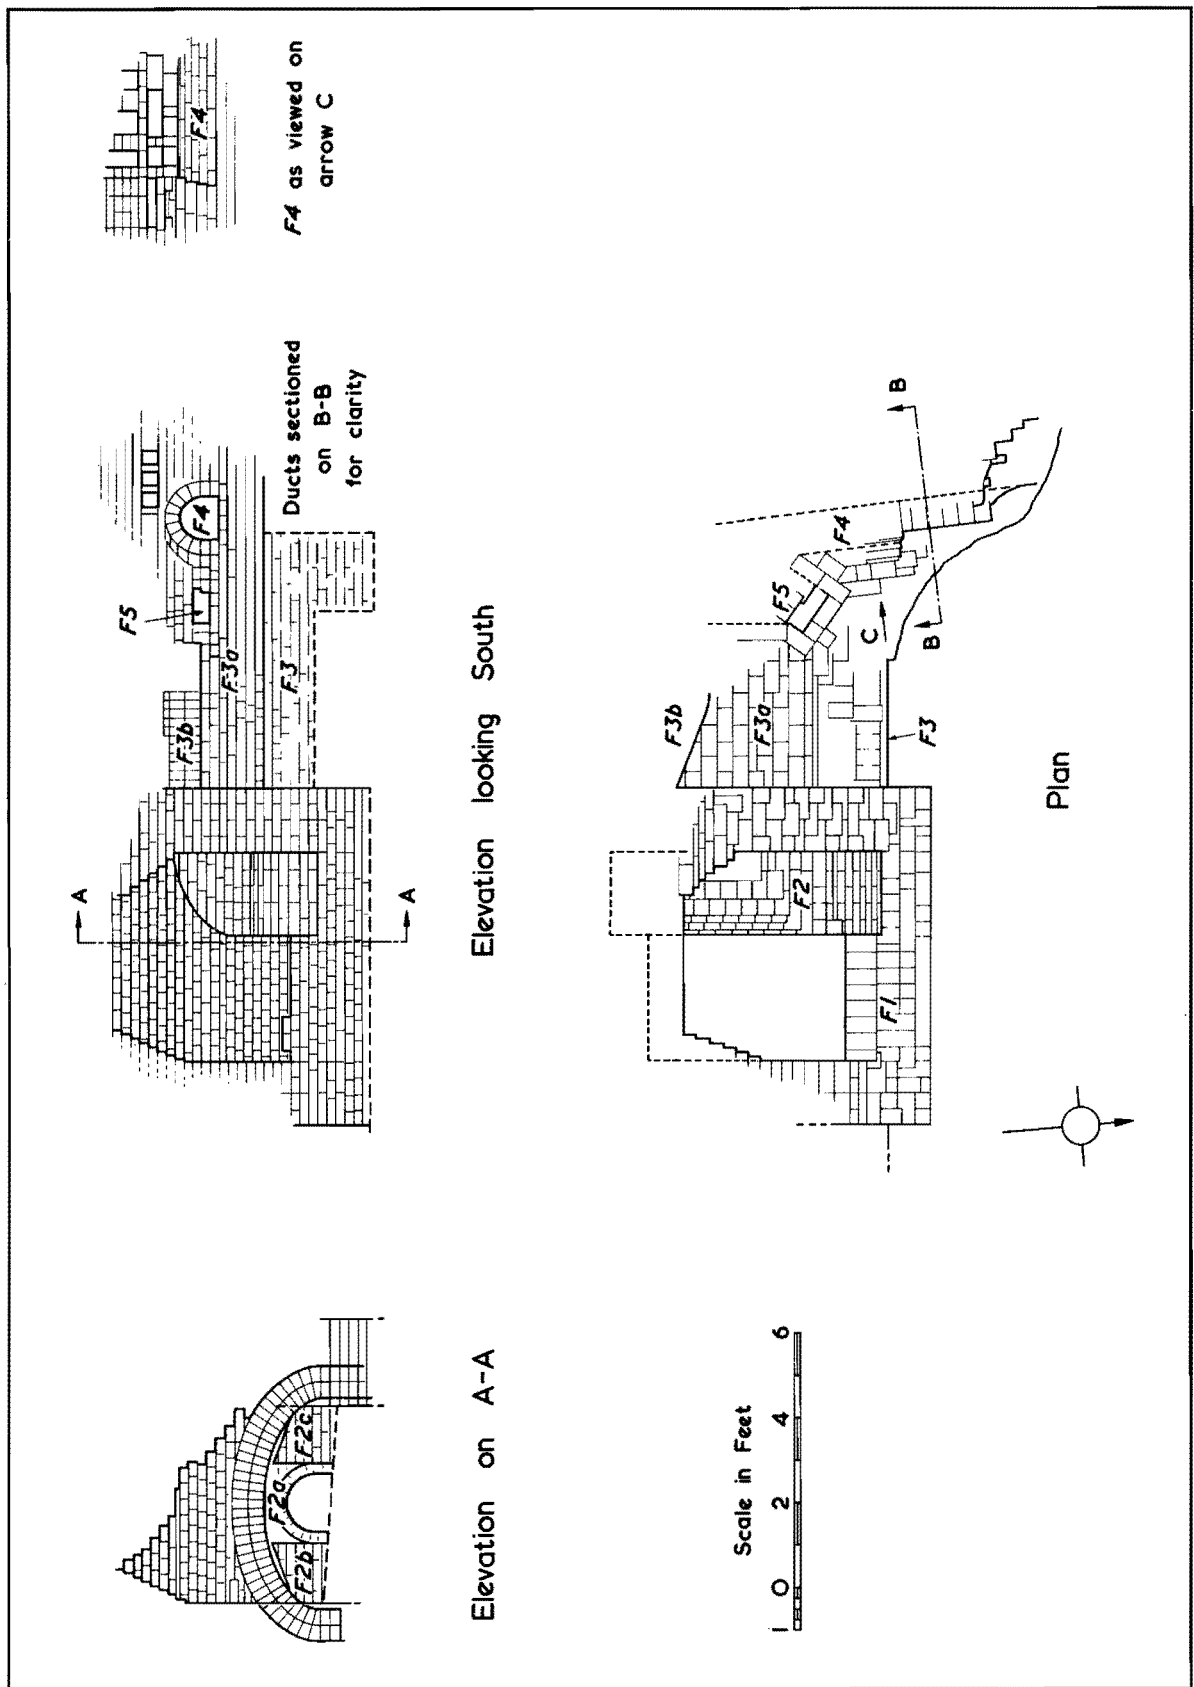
Glasshouse at Norfolk House, Lambeth. Plan and Sections.
